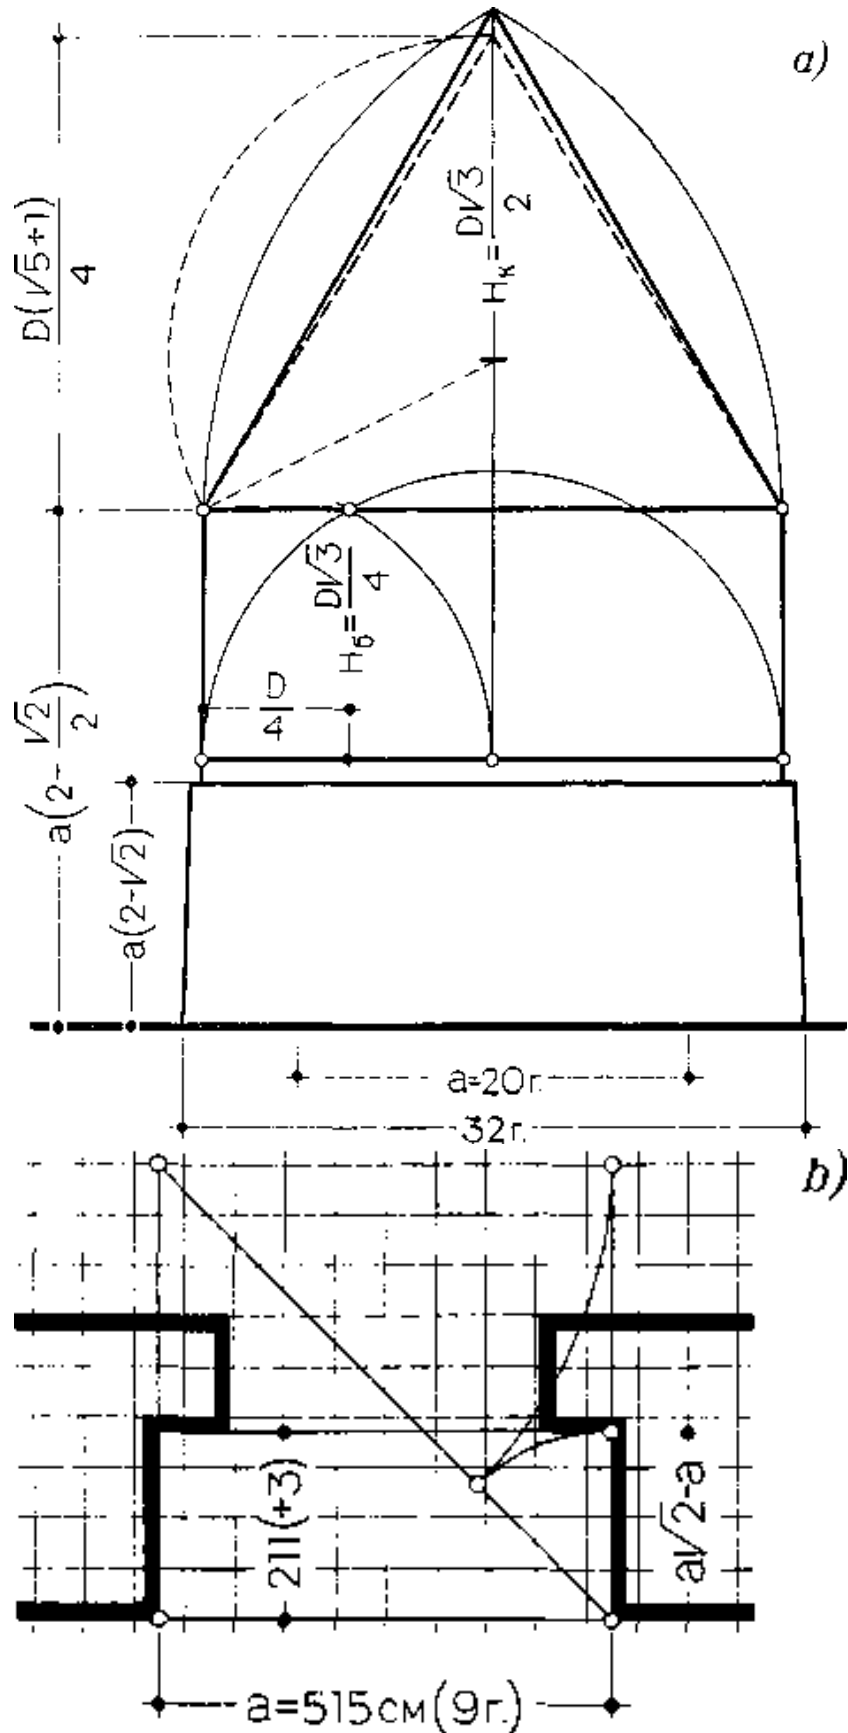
Mausoleum of Muzaffar Text. Facade scheme and entrance plan
